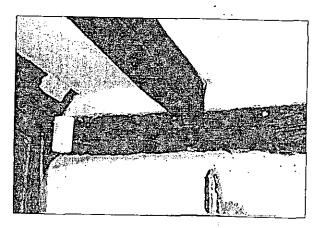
Room 3, lounge. South end of west wall. The cut back section of timber beam may suggest the position of a former entrance door.
